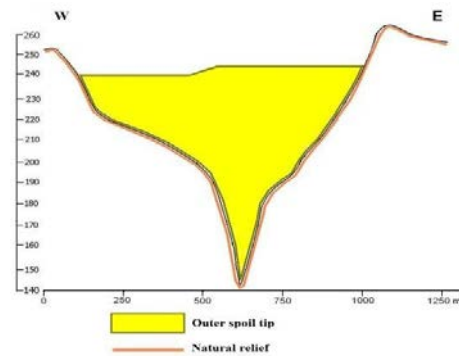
c-d Cross section in the lower part of the outer spoil tip
